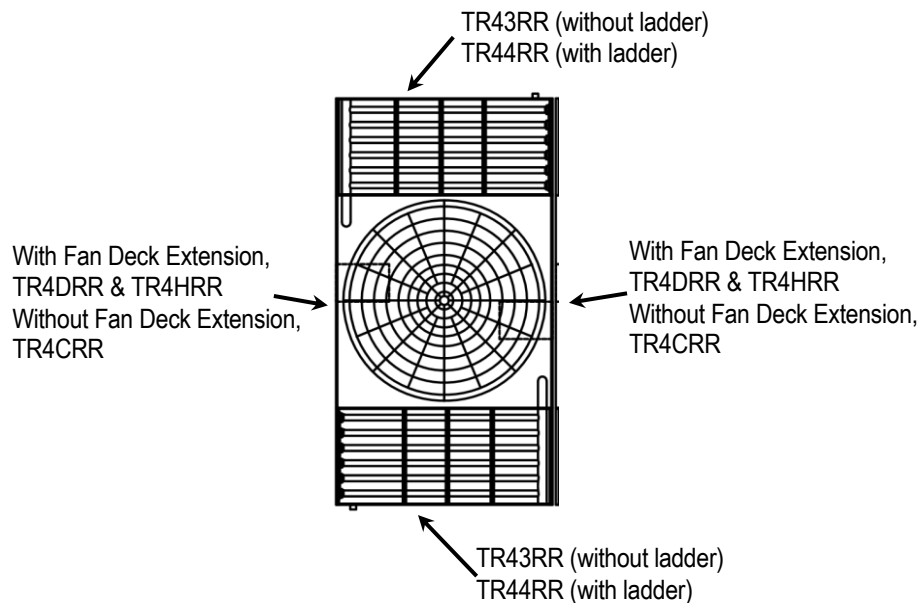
Single-cell Fan Deck Handrail Reference Drawing Arrangement
